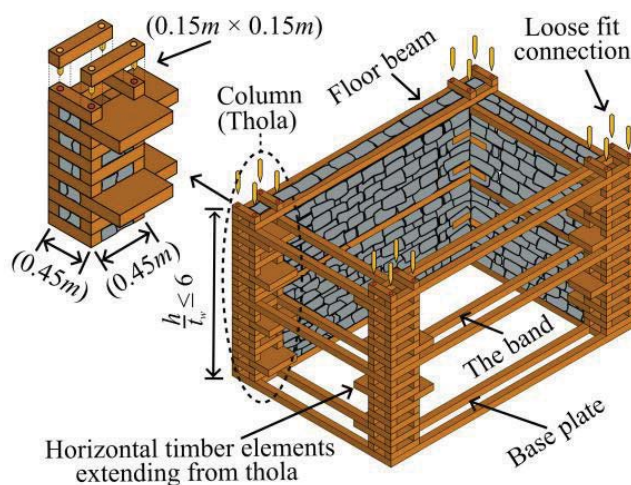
Typical sketch of the load-bearing system in Thathara buildings
